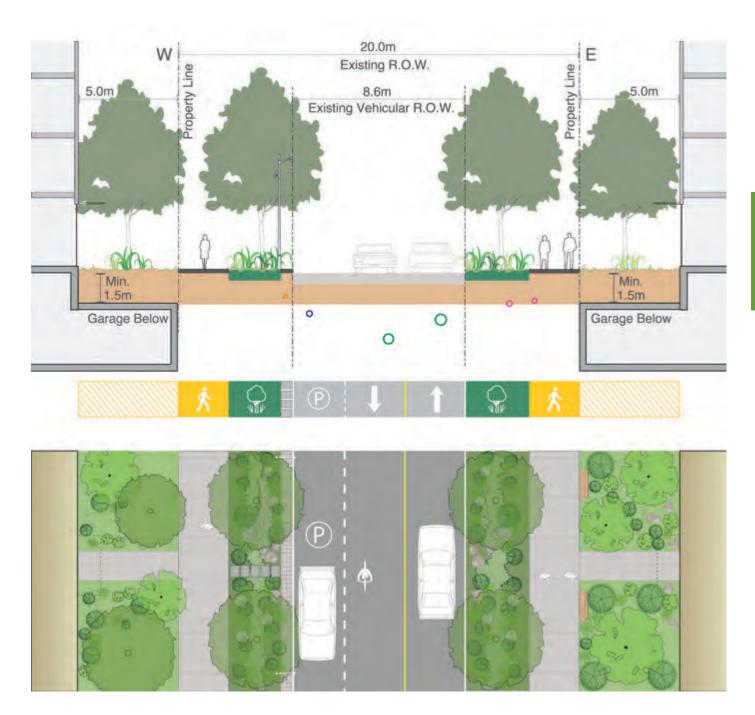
Section and Plan of Holly and Brownlow Greenways - Recommended Final Condition
